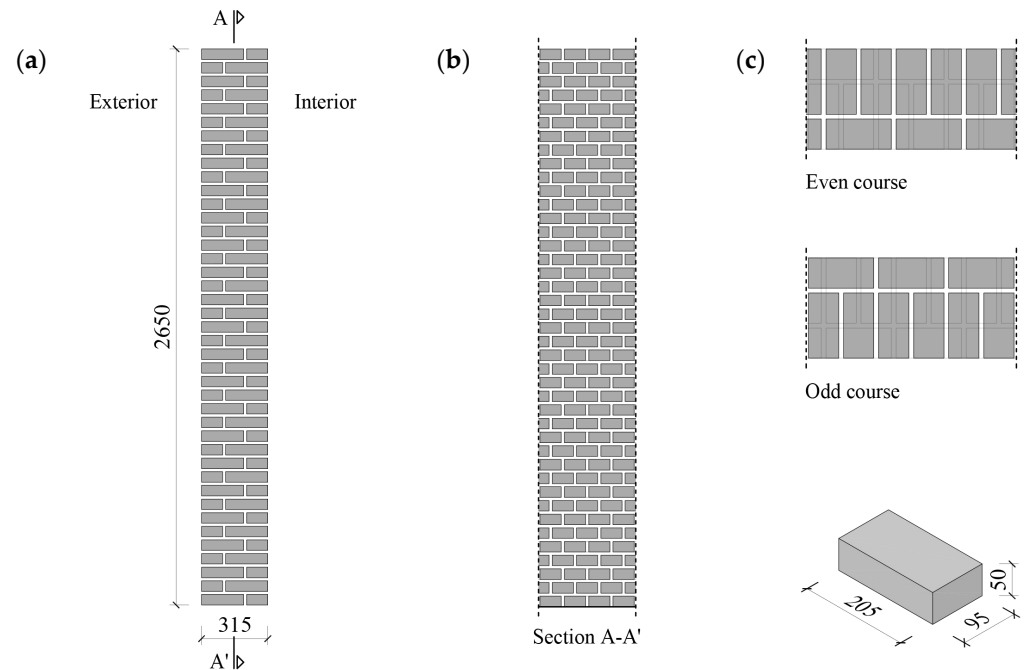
Schematic geometrical configuration of the brick masonry wall: (a) transversal cross-section; (b) vertical cross-section; (c) bond arrangement and geometry of the brick units. Dimensions in mm.
